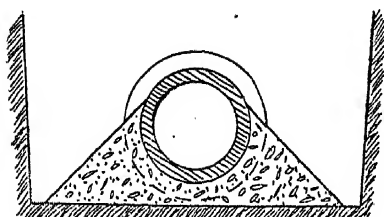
Section through a Trench, showing a Drain-pipe resting on Concrete.
